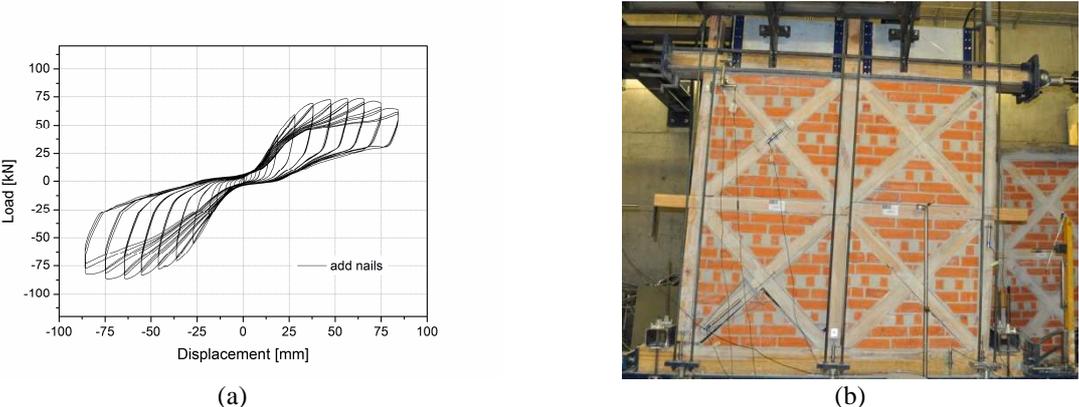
Wall with additional nails at the bottom connections: (a) hysteretic behaviour of the wall; (b) deformation of the wall during testing
